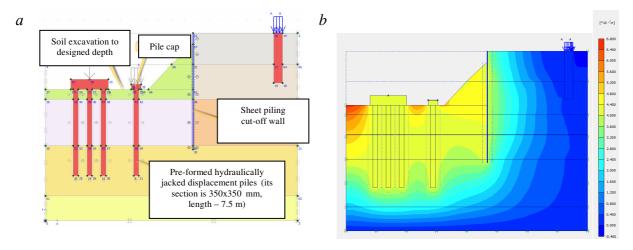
Calculation scheme (a) of the third phase of calculation (soil excavation to designed depth and installation of pre-formed displacement piles of 35x35 mm in section and 7.5 m length, caps installation) correspondent shadings of vertical deformations (b)
